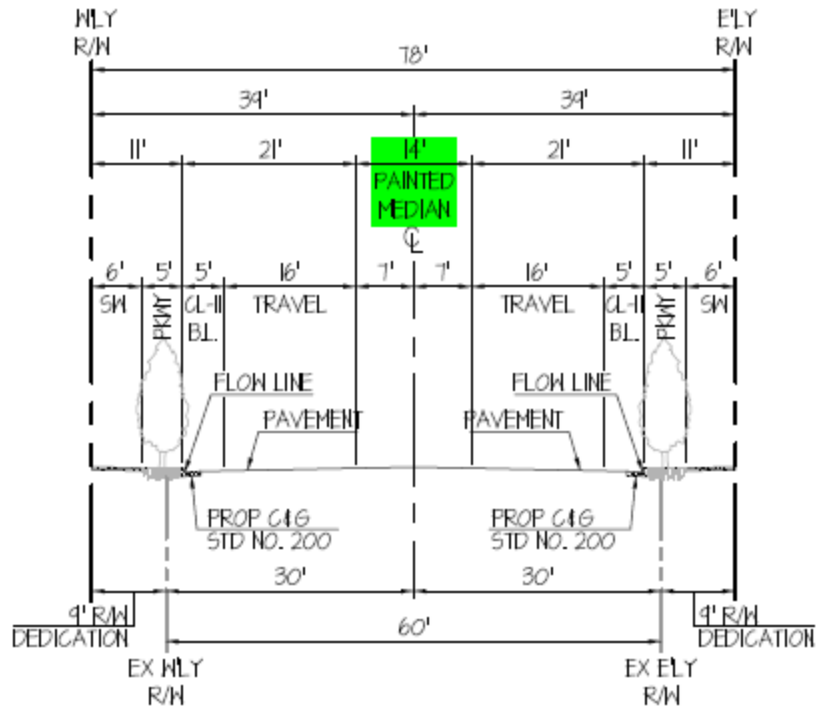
Cross-Section of Proposed Barrett Avenue Segment
